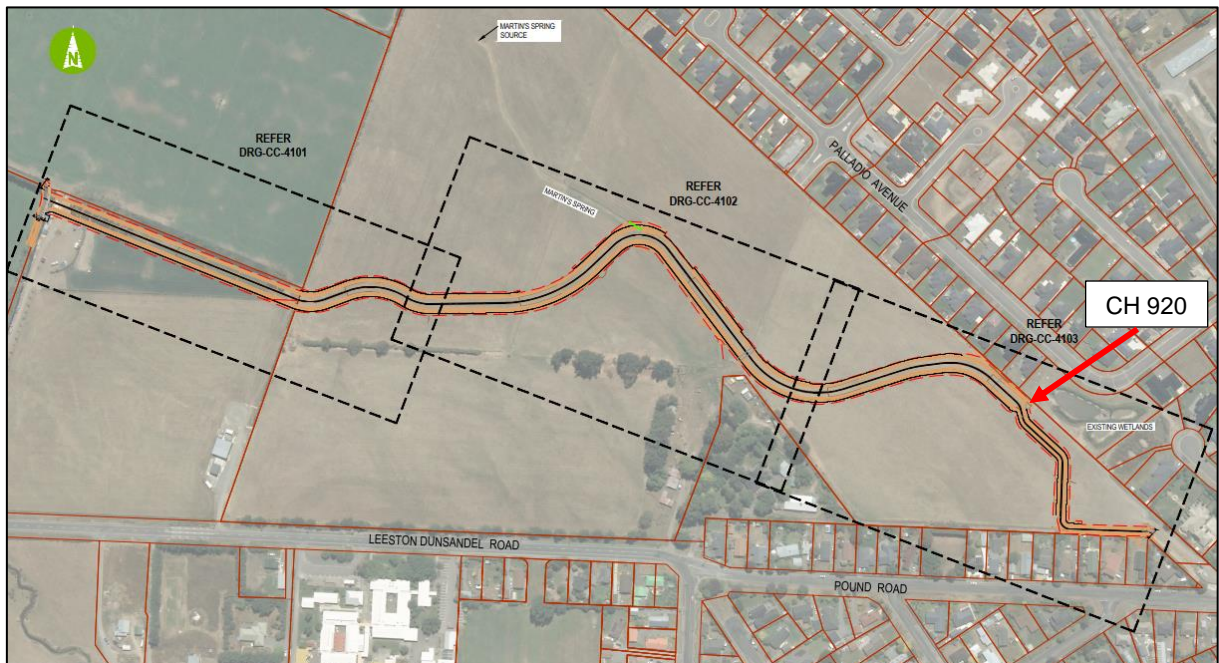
General arrangement of the proposed Stormwater Bypass Channel.
